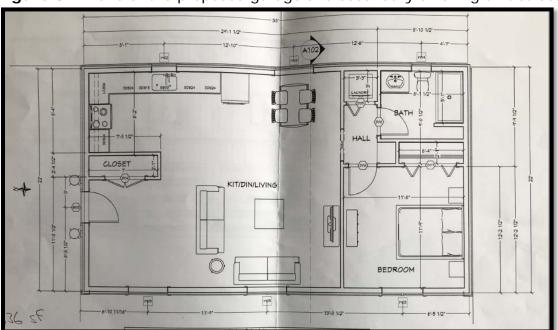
Plans of the proposed garage and secondary dwelling unit structure
